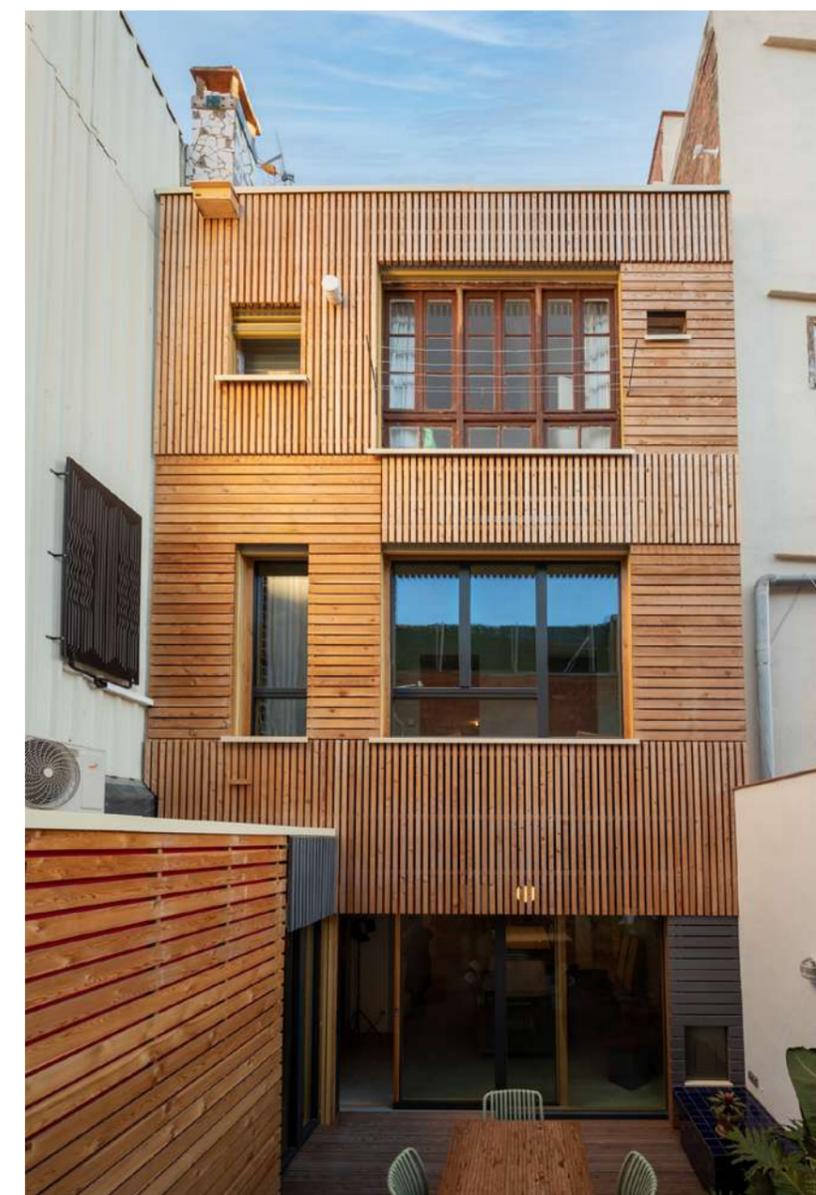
Courtyard's façade, designed as a ventilated wooden façade.
